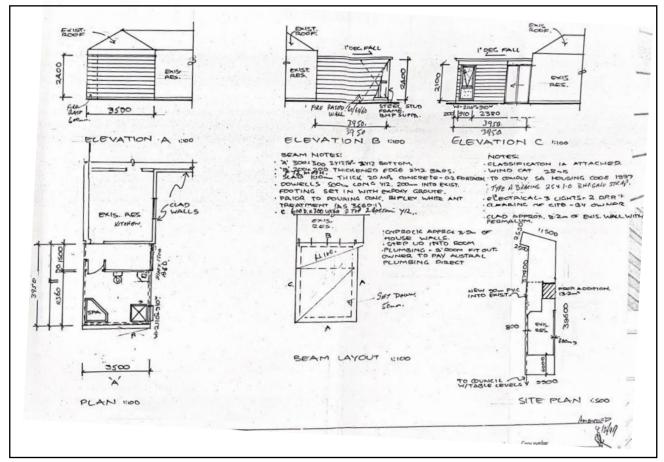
Extract of site plan and elevations – DA 713/1997/DX
